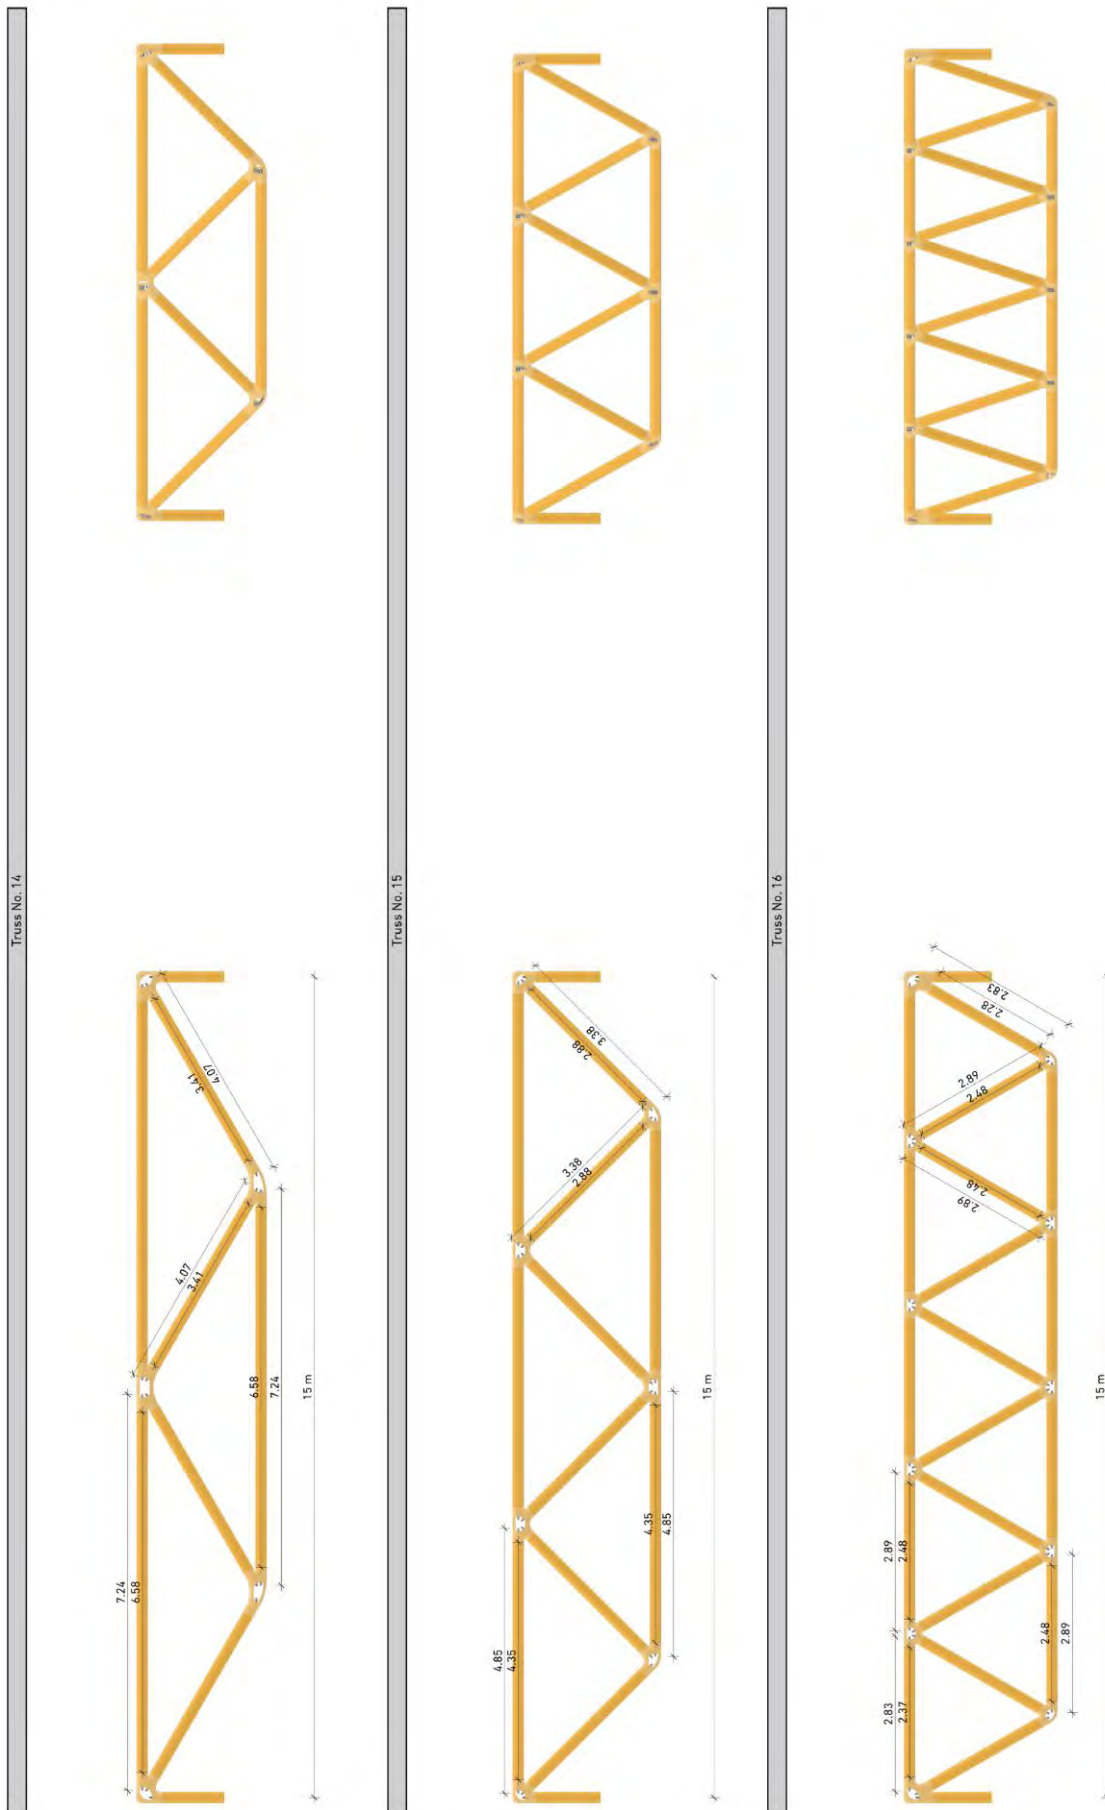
Truss types 14 - 16 (strut member lengths and perspective)
